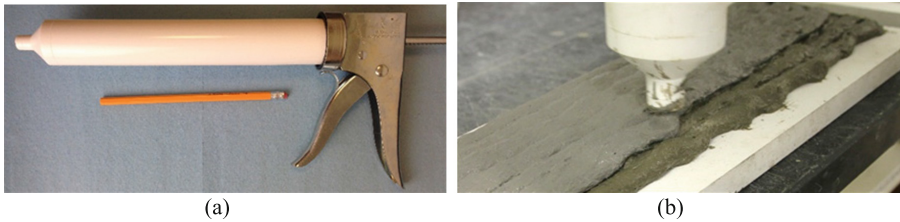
Extruding method: (a) caulk gun with an inner diameter of 8 mm and (b) extruding material using the caulk gun. The caulk gun is mechanically actuated for extrusion of ECC filaments.
